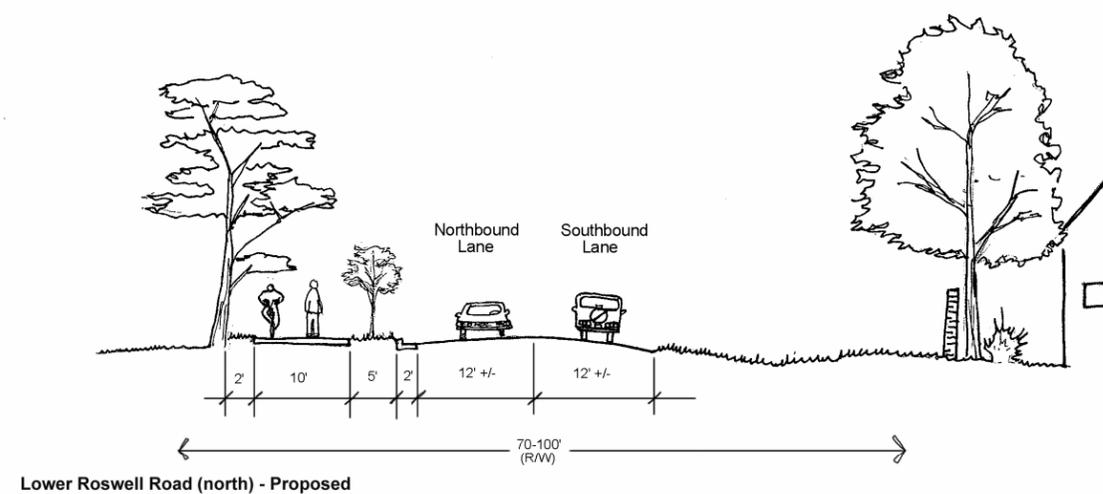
Sketch of Proposed Multi-Use Trail Along Lower Roswell Road (northbound) by Gold Branch.
